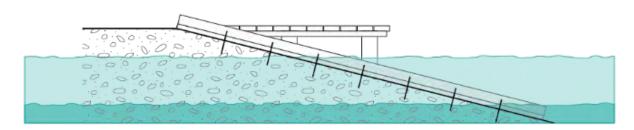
Boat Ramp Alternative 2 (Rub Rails)
